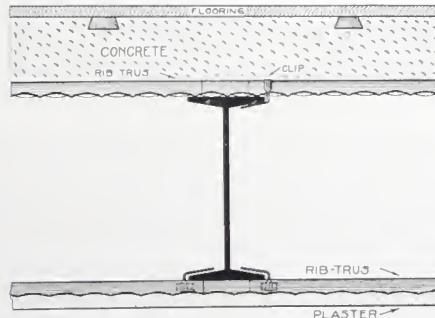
Flat Arch Floor Construction with Flat Furred Ceiling
